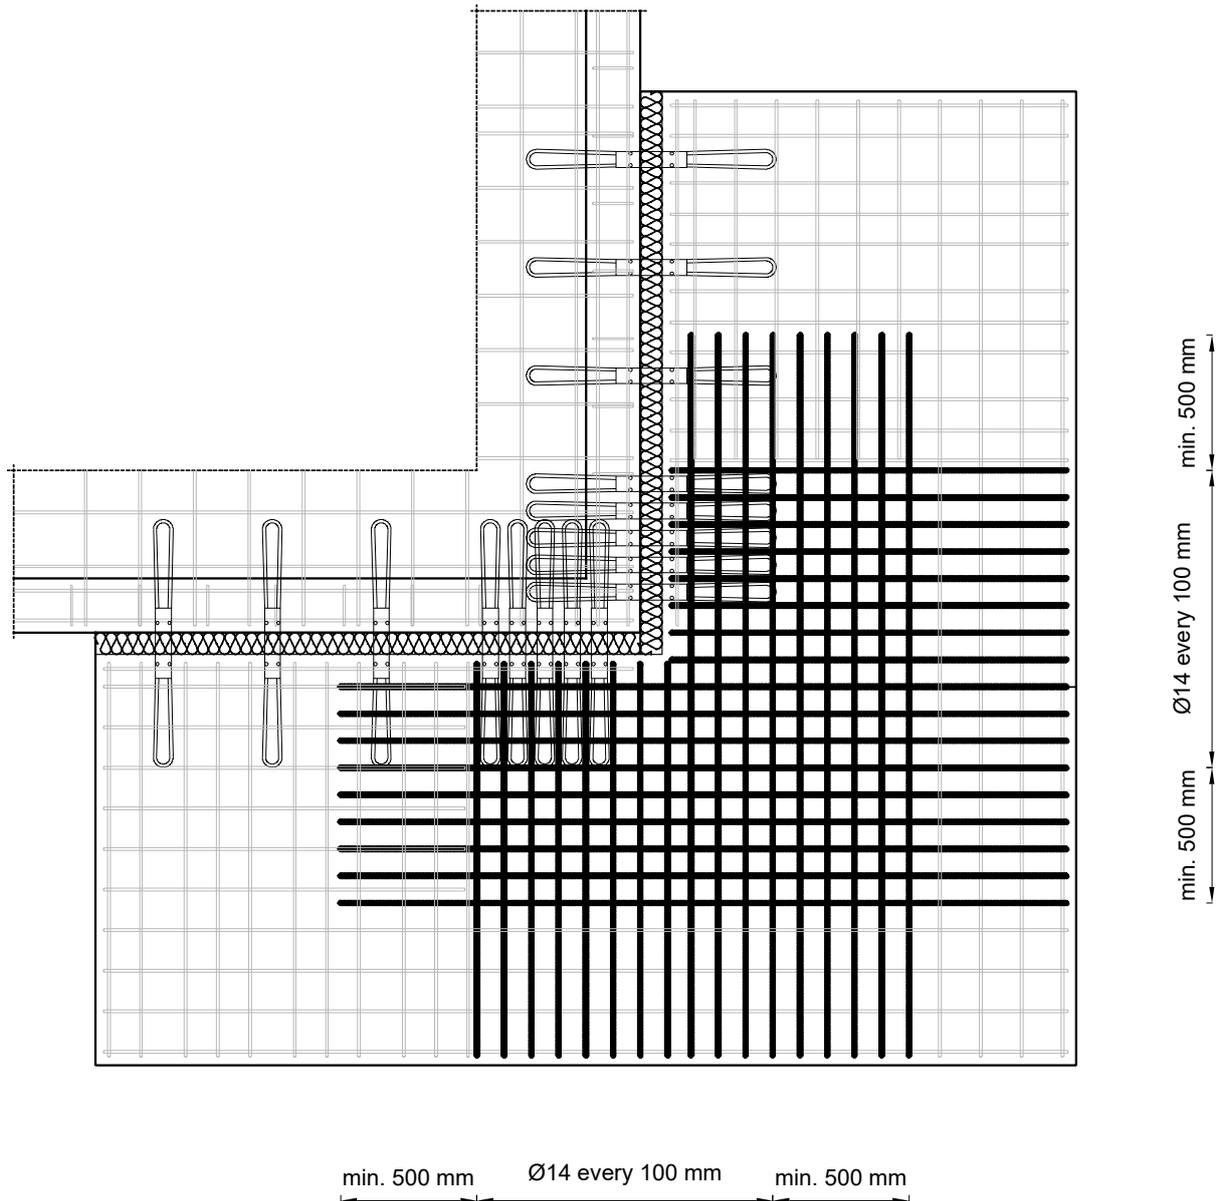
Example of laying of the upper reinforcement in the corner cantilevered balconies
